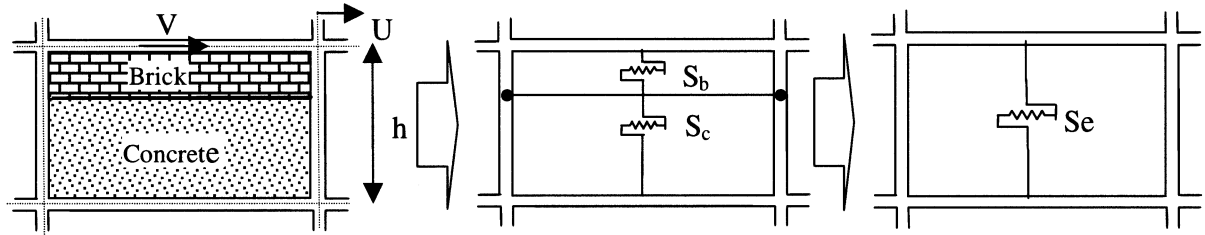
f. Infill horizontally multipart masonry walls Type G.
